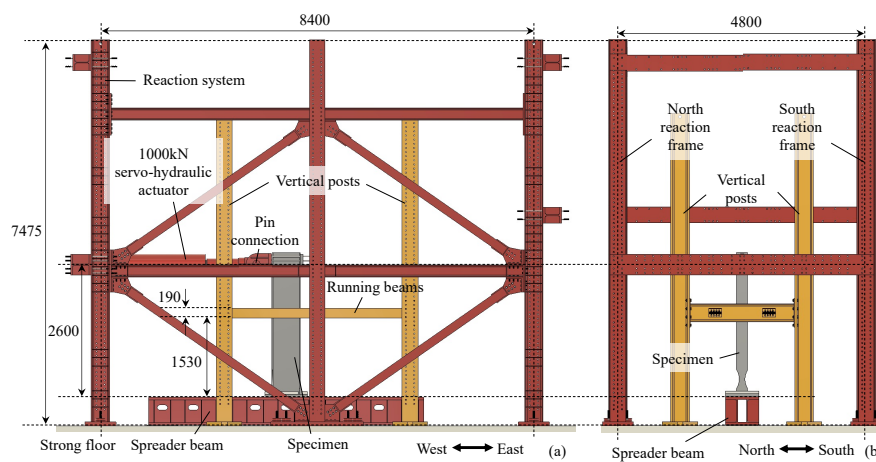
Test setup with nominal dimension (Unit: mm): (a) elevation view and (b) side view.
